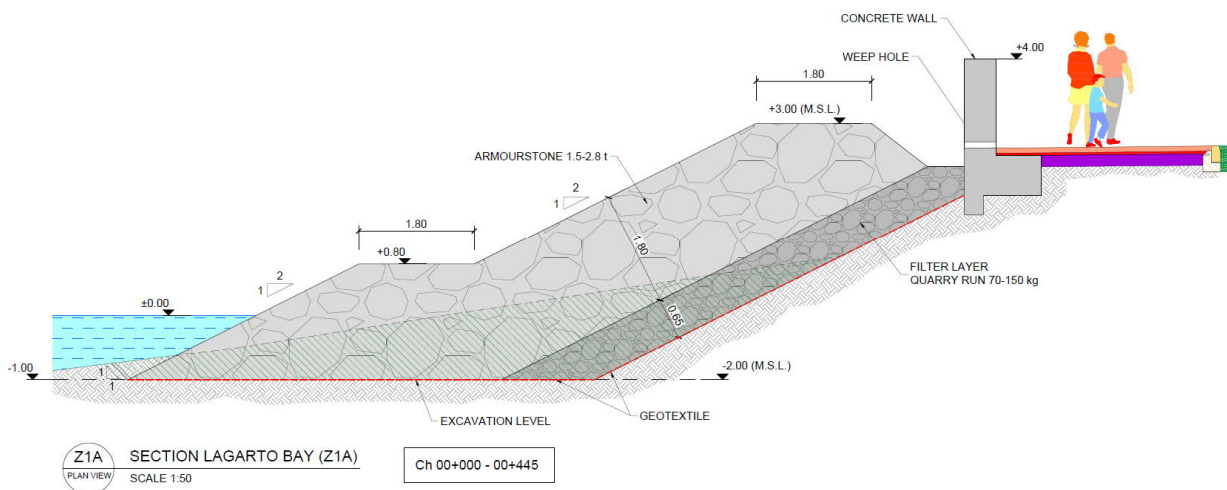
Typical cross section. Lagarto Bay (CH 0+000 – 0+448)
